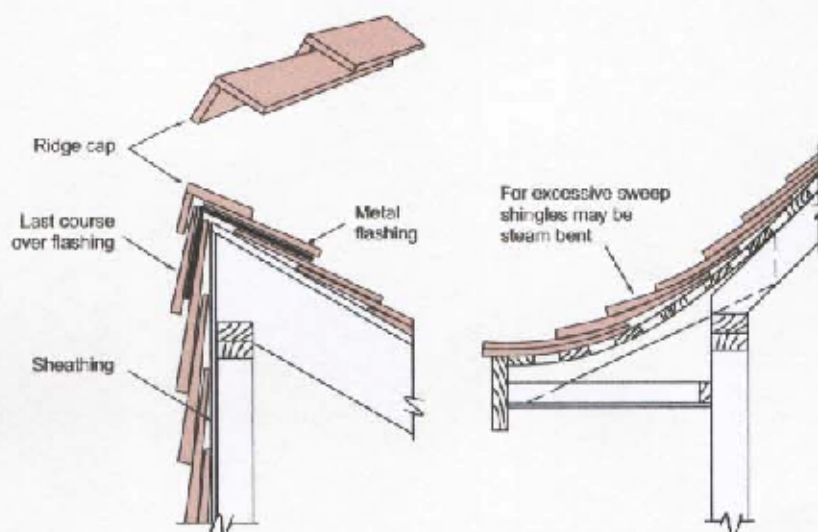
Apex Roof Juncture and Swept or Bell Eave
